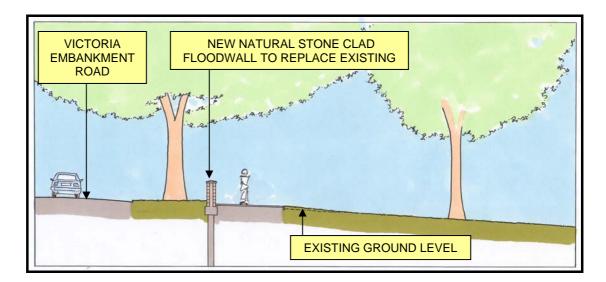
Cross Section of New Floodwall at Victoria Embankment; wall along existing alignment
